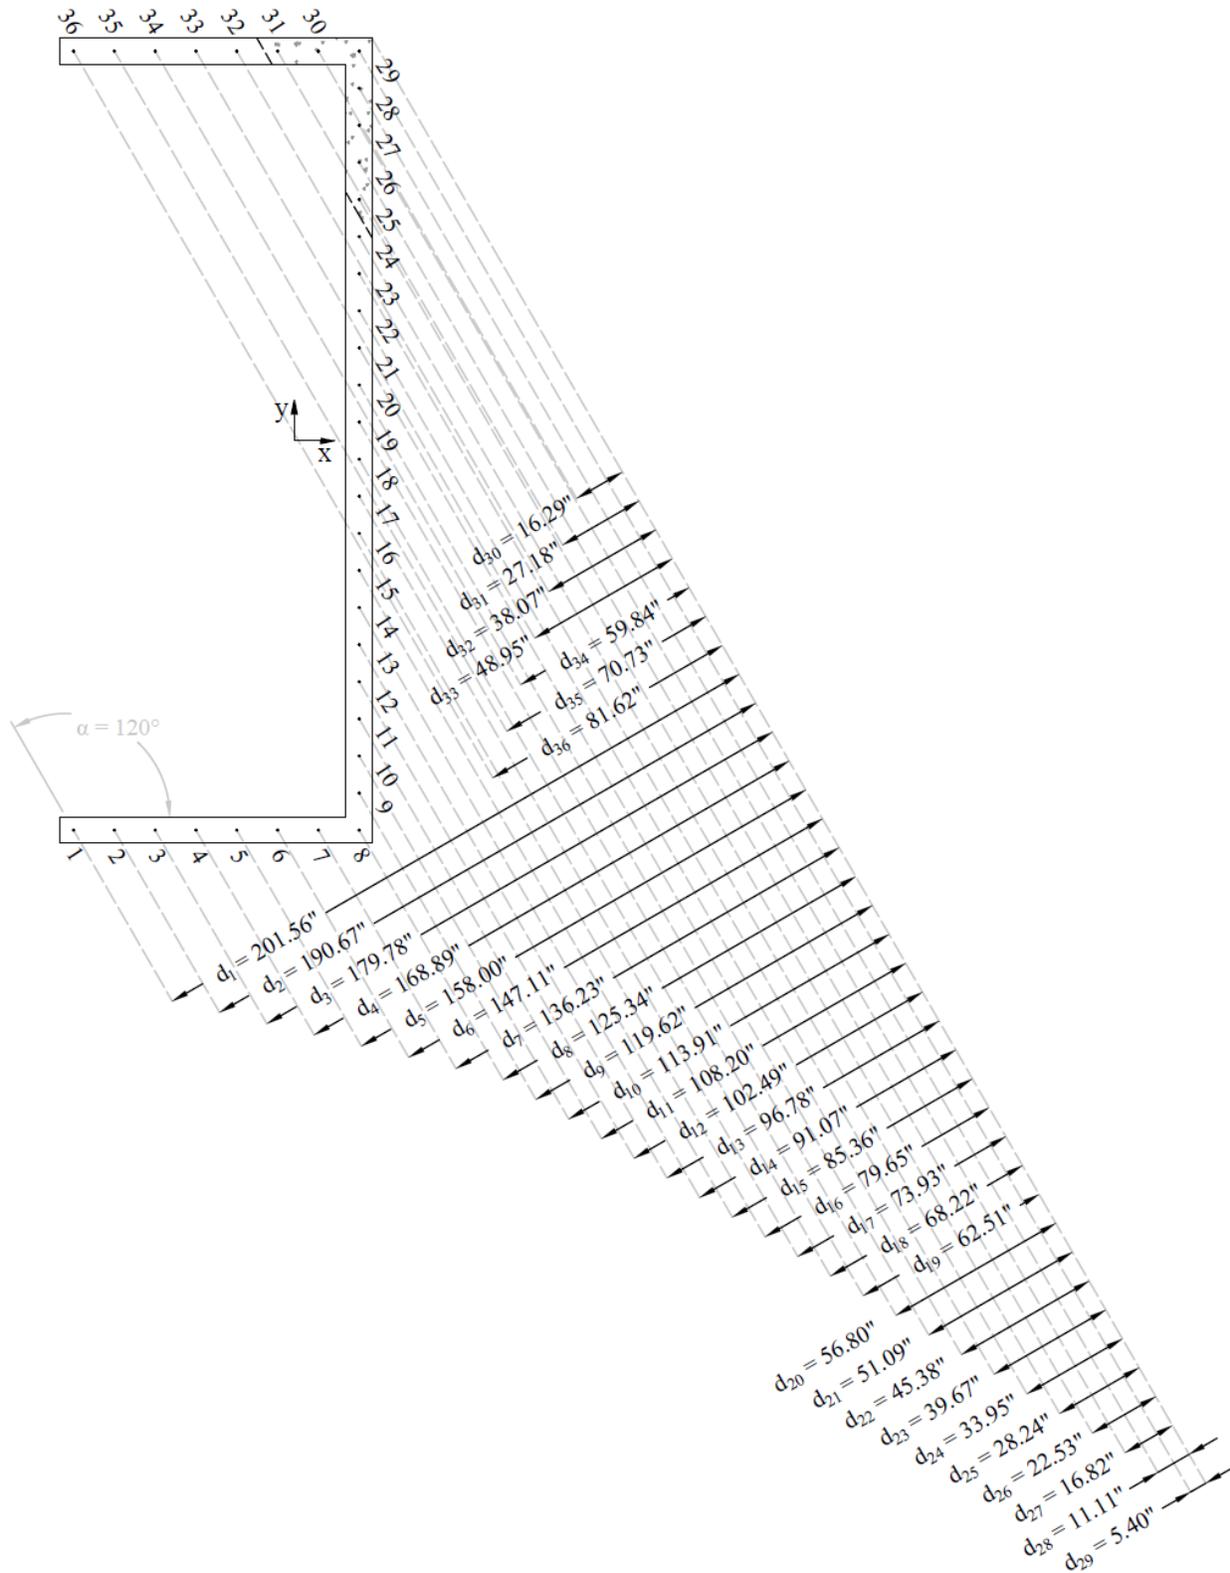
C-Shaped Core Wall Cross-Section and Reinforcement Locations
